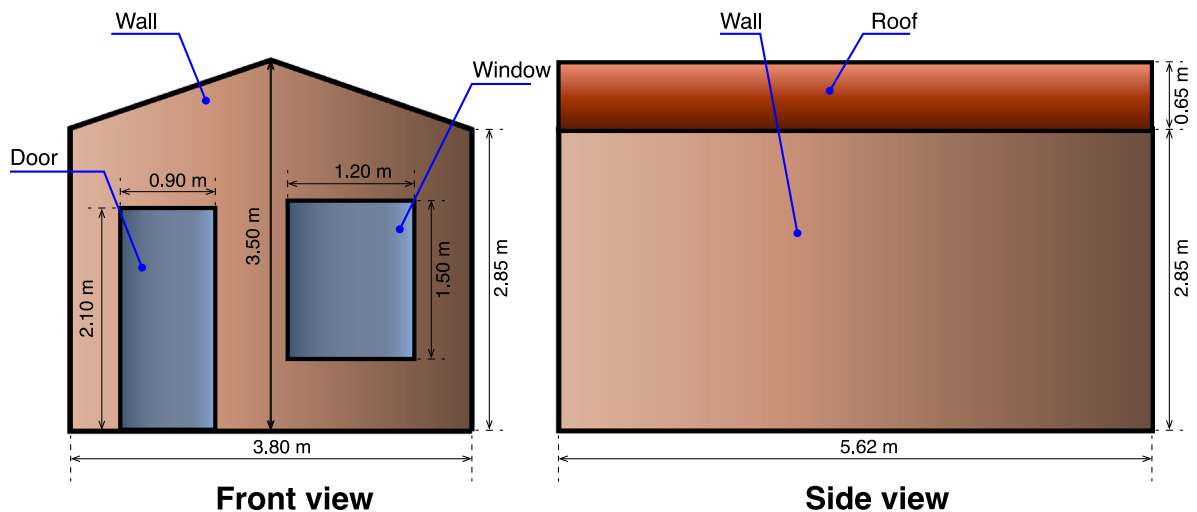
Schematic views and dimensions of the prefabricated temporary house model from Ye et al. [319], used in the carbon footprint assessment. Dimensions for walls, roof, door (0.90 × 2.10 m), and window (1.20 × 1.50 m) are shown.
